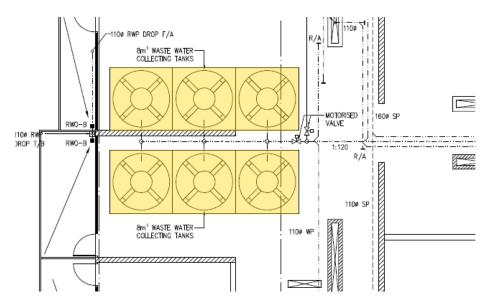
Wastewater Collection Tanks on 42nd Floor
